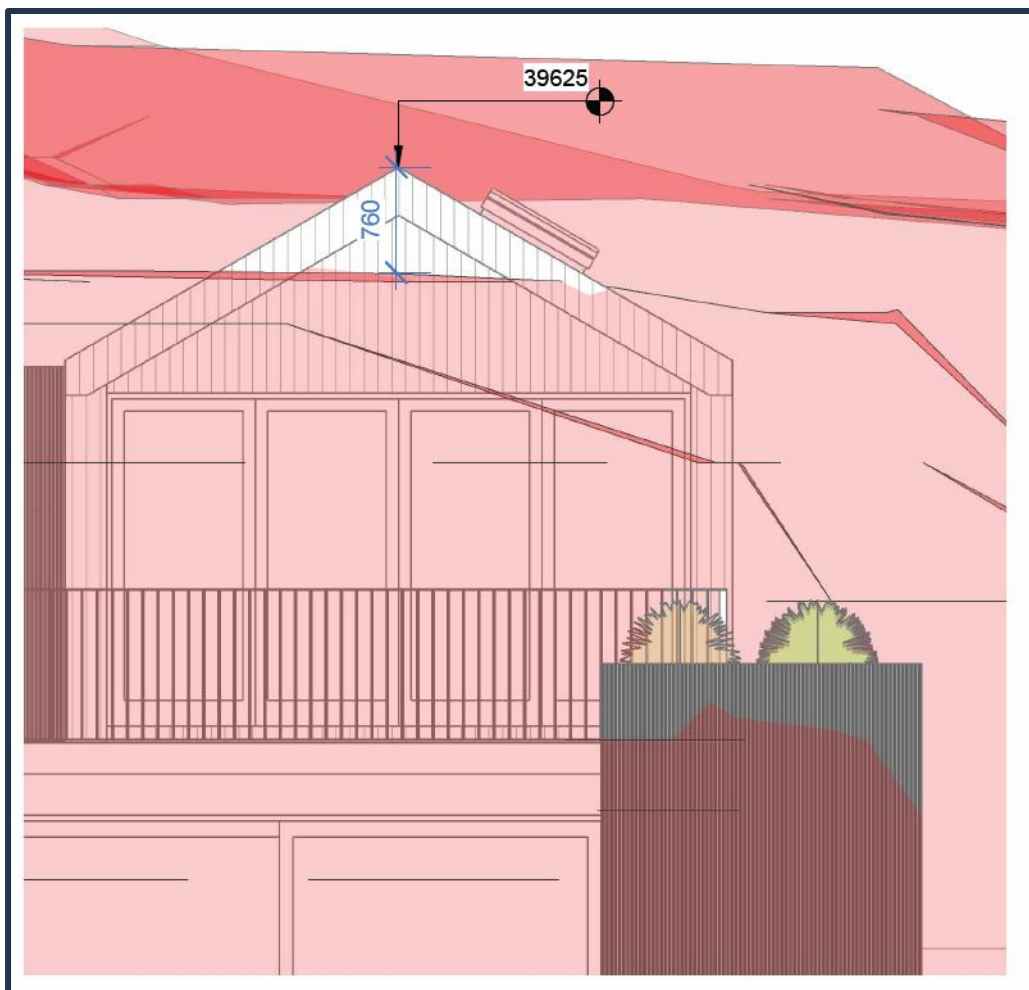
Height Compliance Detail demonstrating the proposed exceedance of the building height control (Source: Sachs Architecture)
